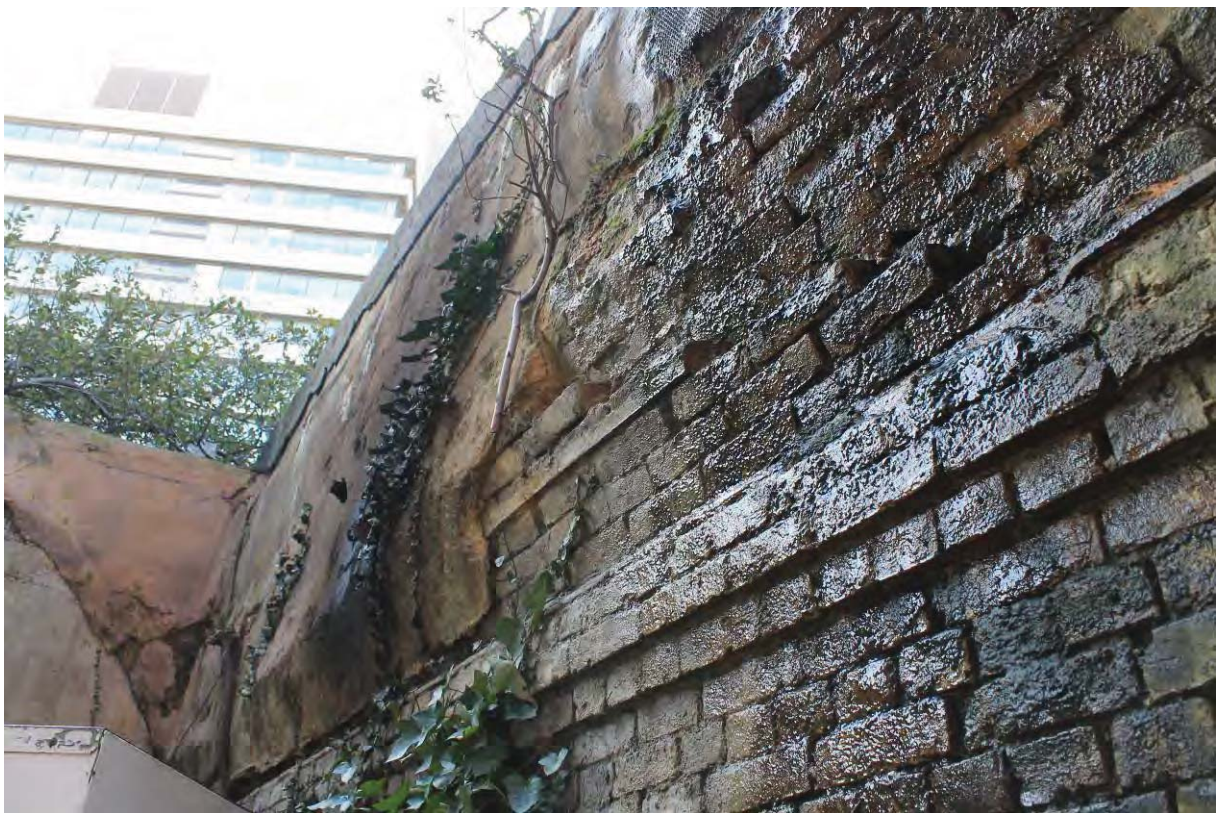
Truncated brick arch and decorative brick impost band along cut back eastern facing elevation, looking south-west
